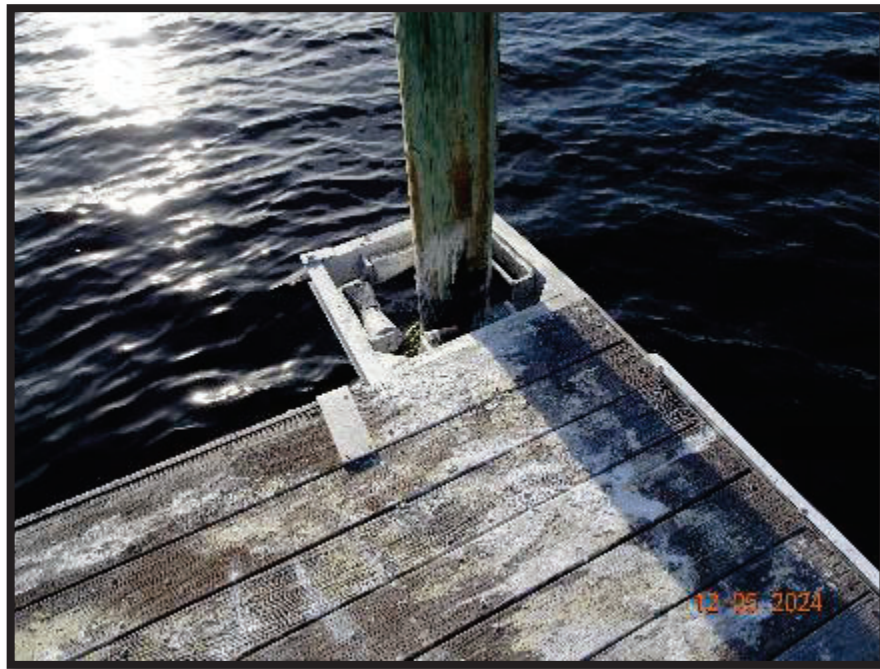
View of roller pile guide with one missing rubber roller. Existing rubber rollers were observed to be degraded and deteriorated.
